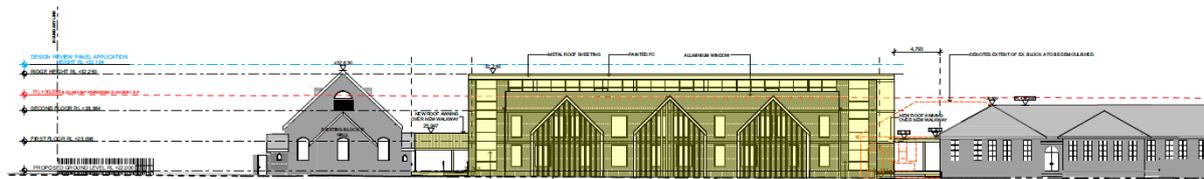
Proposed Western Elevation (showing new building)- Block A and C
